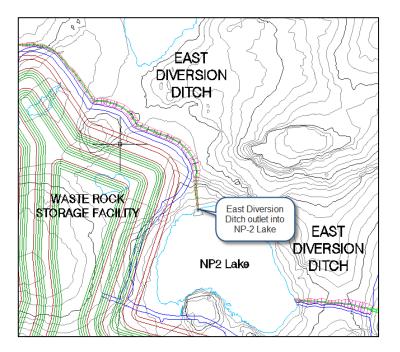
View of the East Diversion ditch outlet into NP-2 Lake
